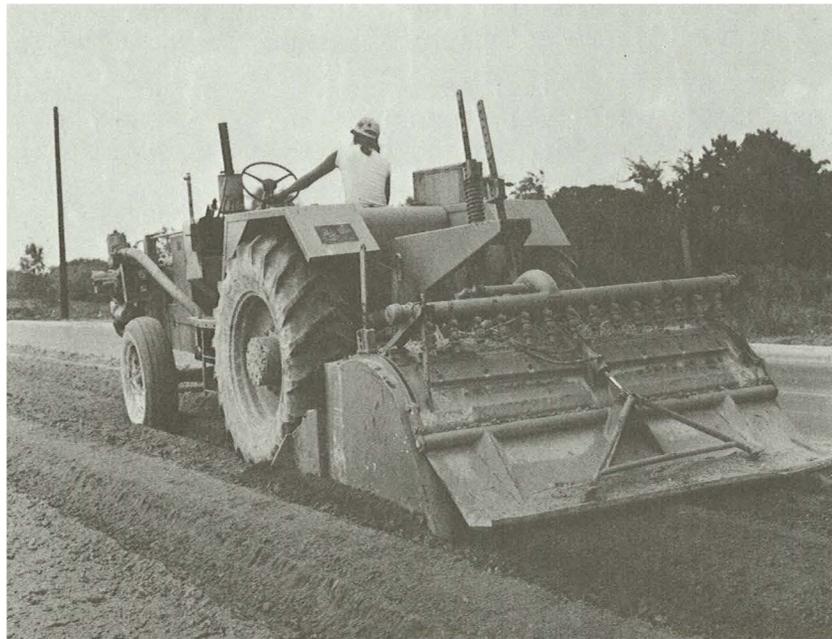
Mixing hydrated lime in subgrade soil of sulphur-asphalt test section
